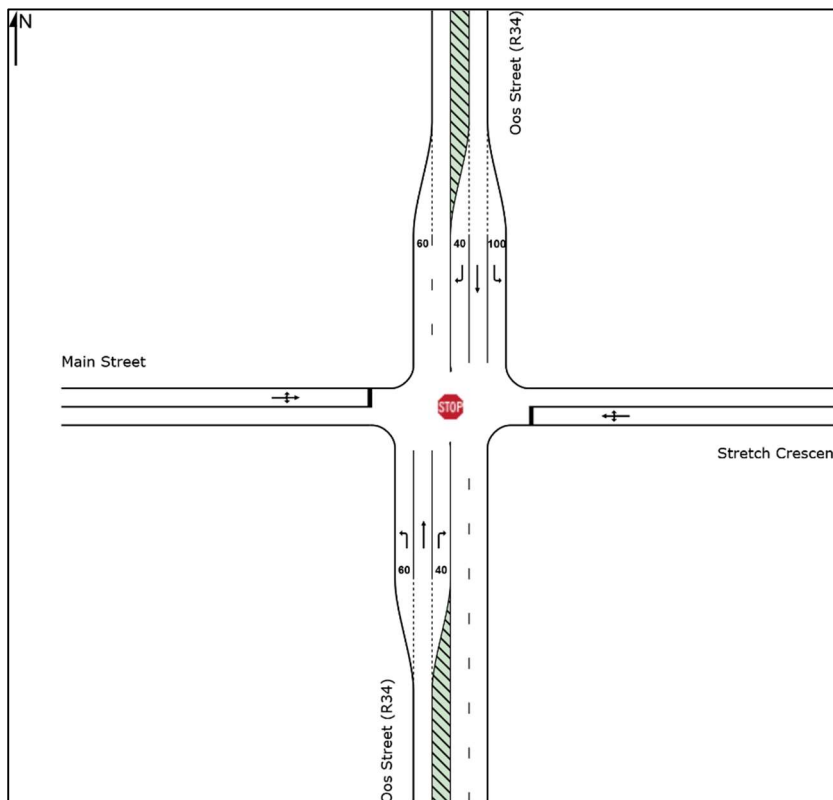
Oos Street (R34) and Stretch Crescent/ Main Street - Existing Layout
